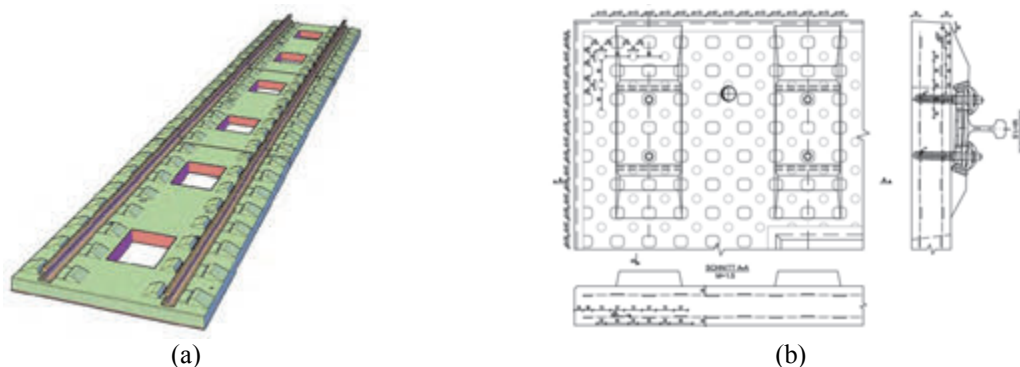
Railway supporting RC Slabs to be reinforced with the innovative steel sheet reinforcement. (a) 3D view, and (b) constructional detail for the placement of the sheet reinforcement (Rauch, 2014)
